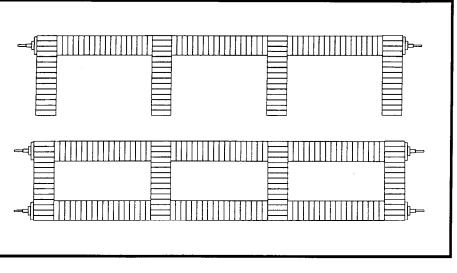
Schematics of stress-laminated T- and box-section bridges.
